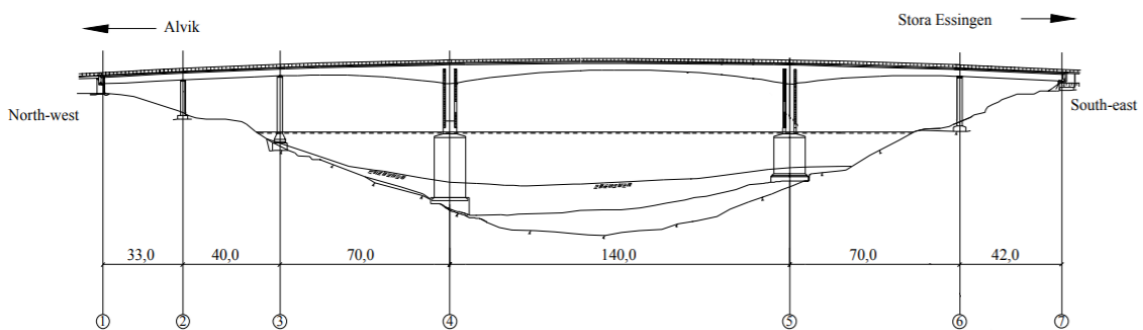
Spans and piers of the Alvik bridge. (Appendix B.1).
